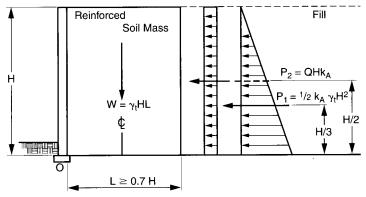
Design analysis for mechanically stabilized earth retaining wall having horizontal backfill. (Adapted from AASHTO, "Standard Specifications for Highway Bridges," 16th ed., American Association of State Highway and Transportation Officials, Washington, DC.)
